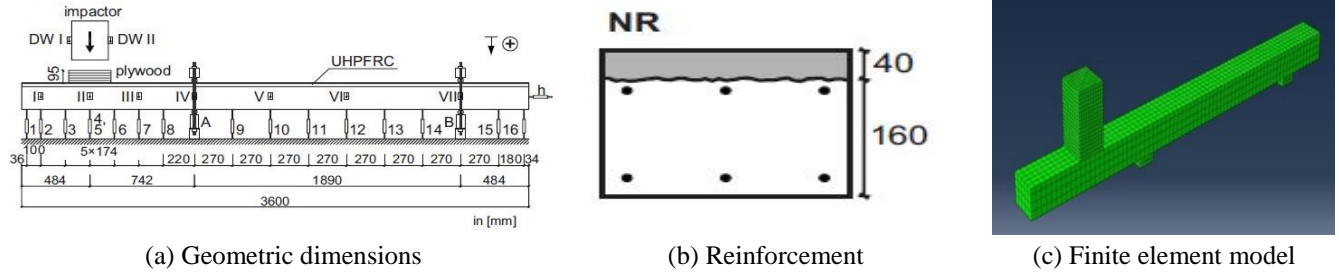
Geometric dimensions, reinforcement and model of the slab strip
